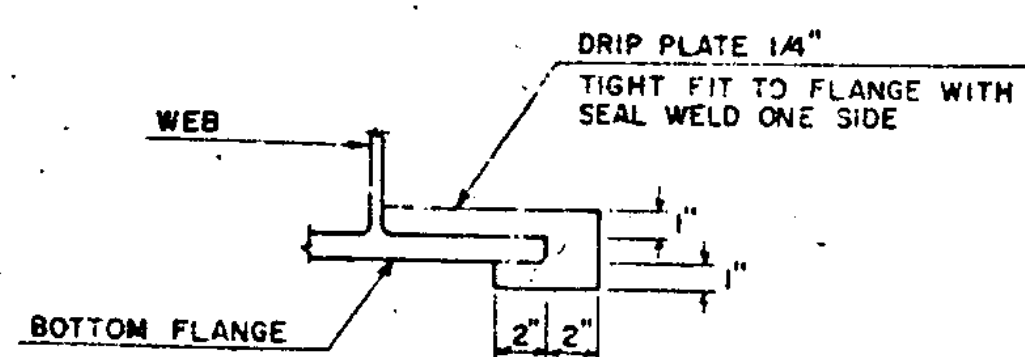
DETAILS OF PIER DIAPHRAGM CONNECTIONS
